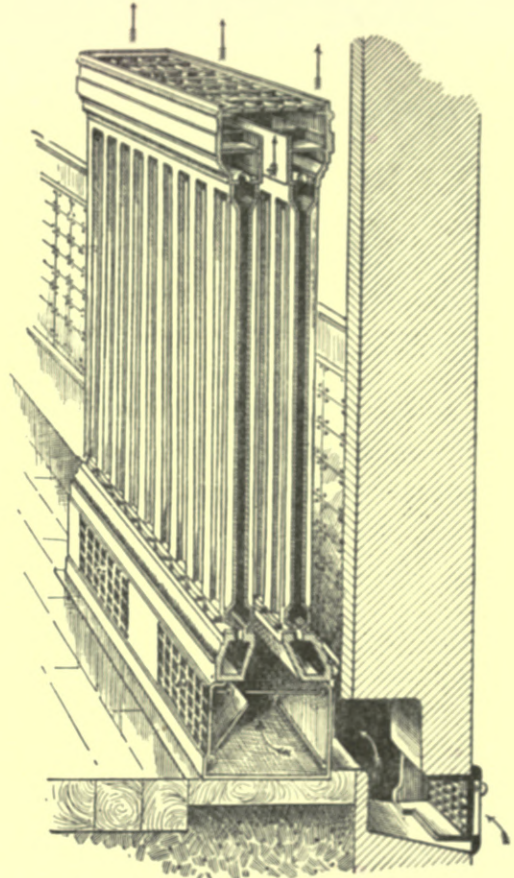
Sectional View of Rosser & Russell's Ventilating Radiator.
